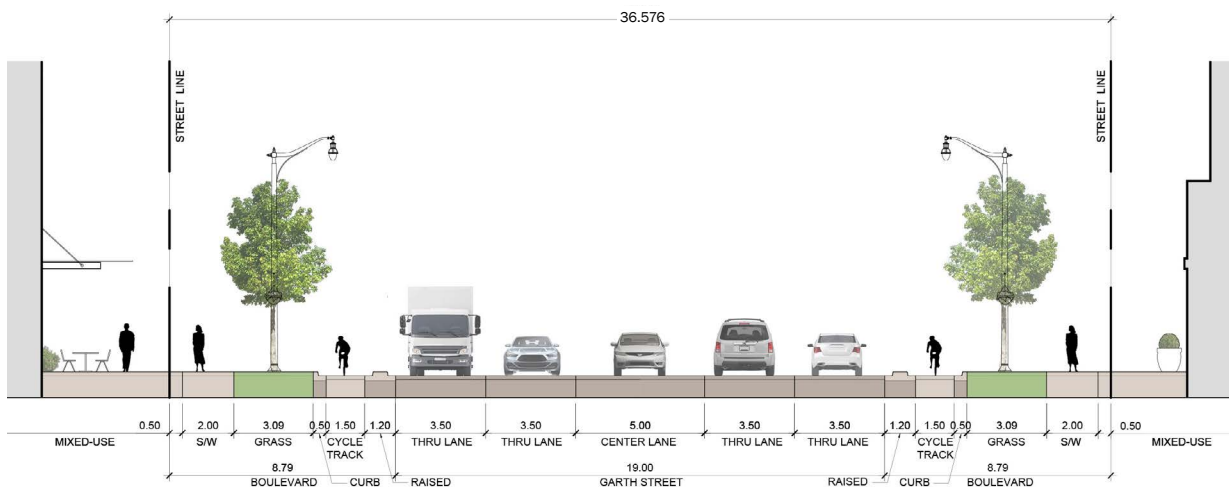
Garth Street Minor Arterial Road (Street "A") Cross Section through Mixed-Use Area
